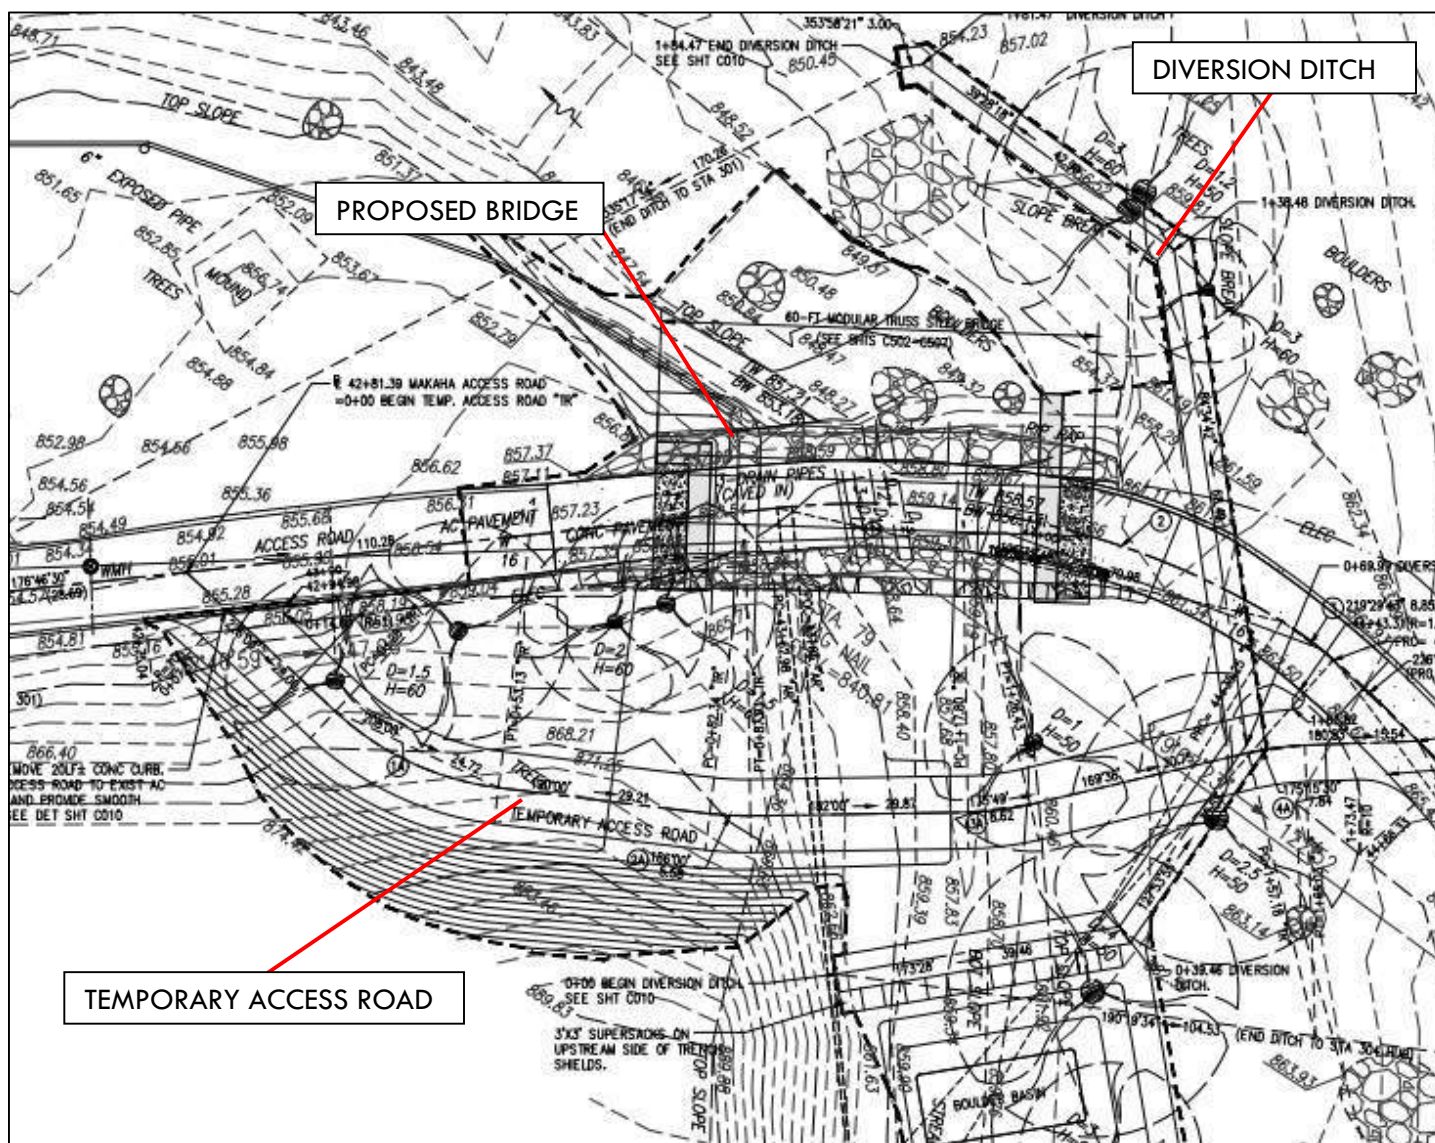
Proposed Acrow Bridge Crossing Layout with Diversion Ditch and Temporary Access Road
